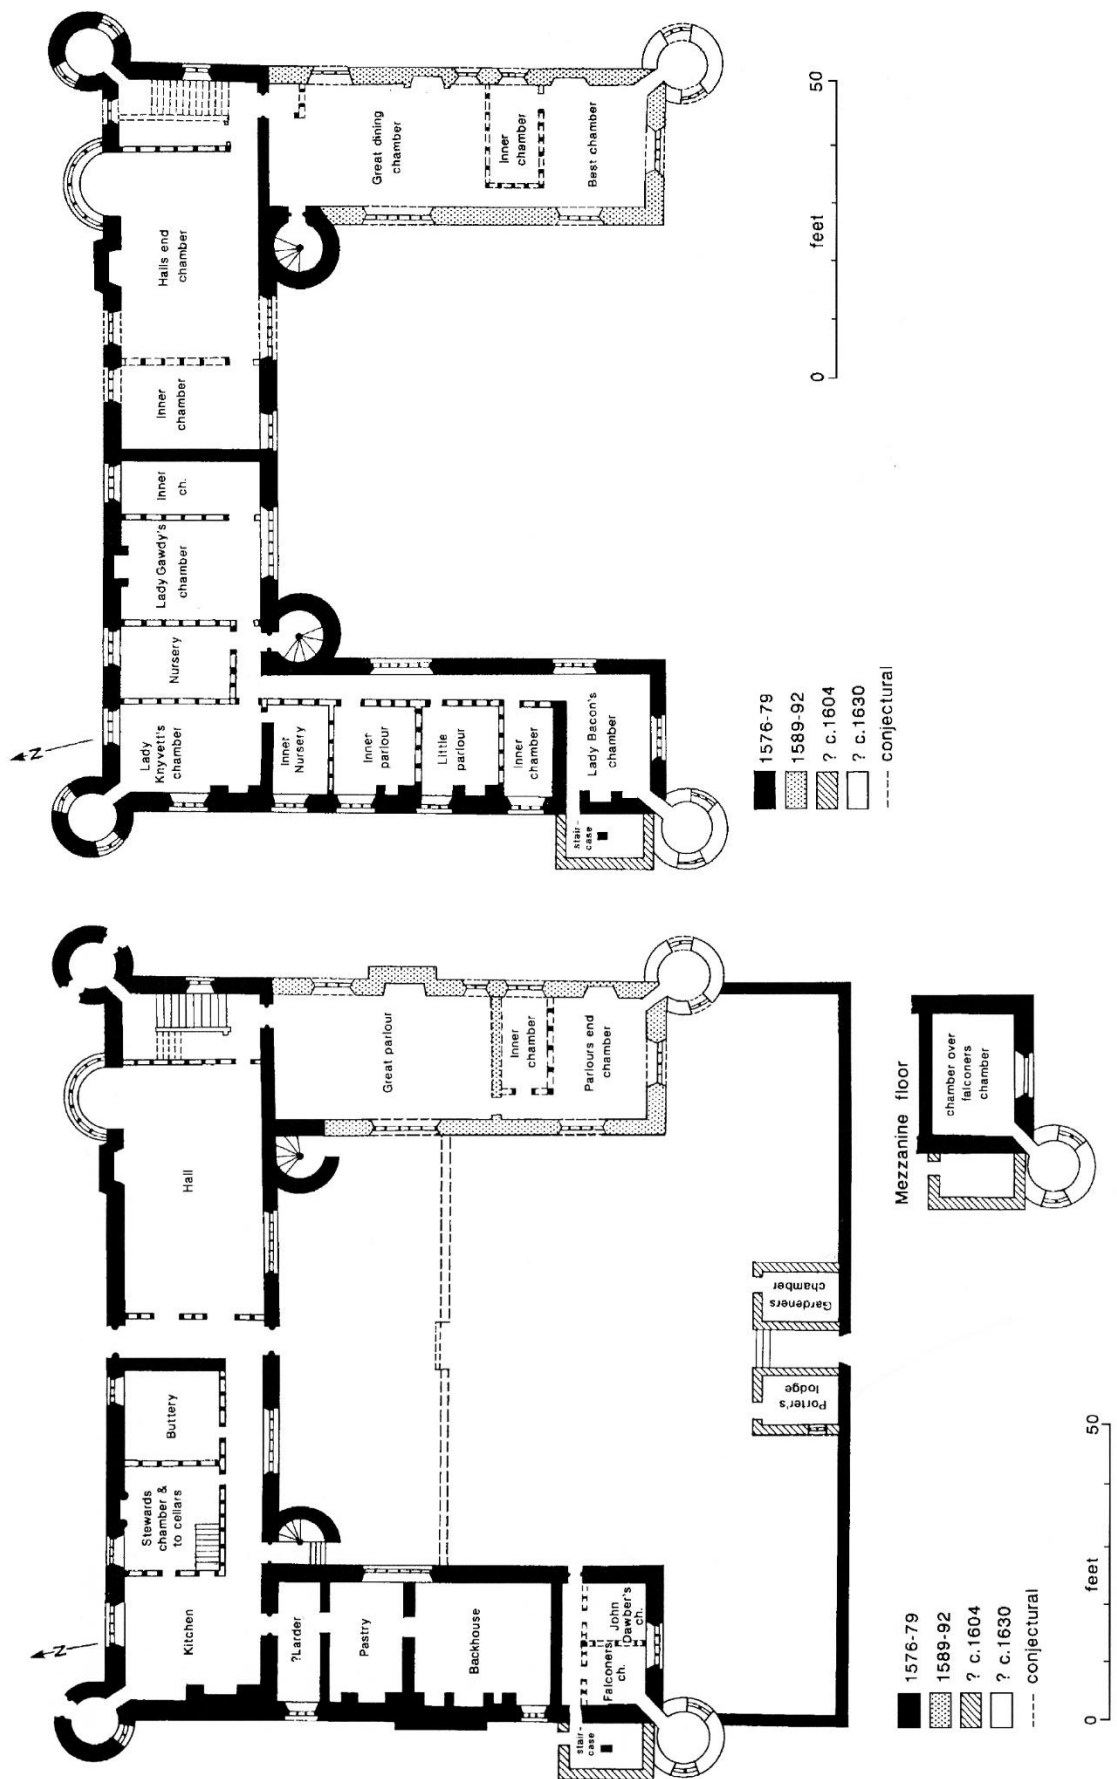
Reconstructive plans of ground and first floors of Stiffkey Old Hall, by Alfred Hassell Smith (Smith, 2002 figs. 1-2)
